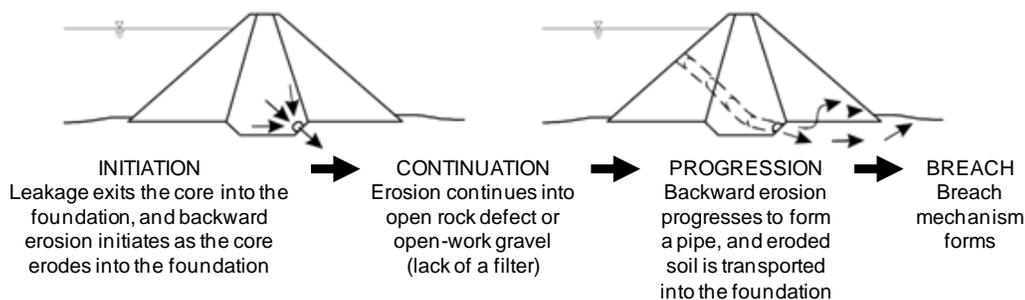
Internal Erosion of the Embankment into the Foundation (adapted from Fell et al. 2008)
